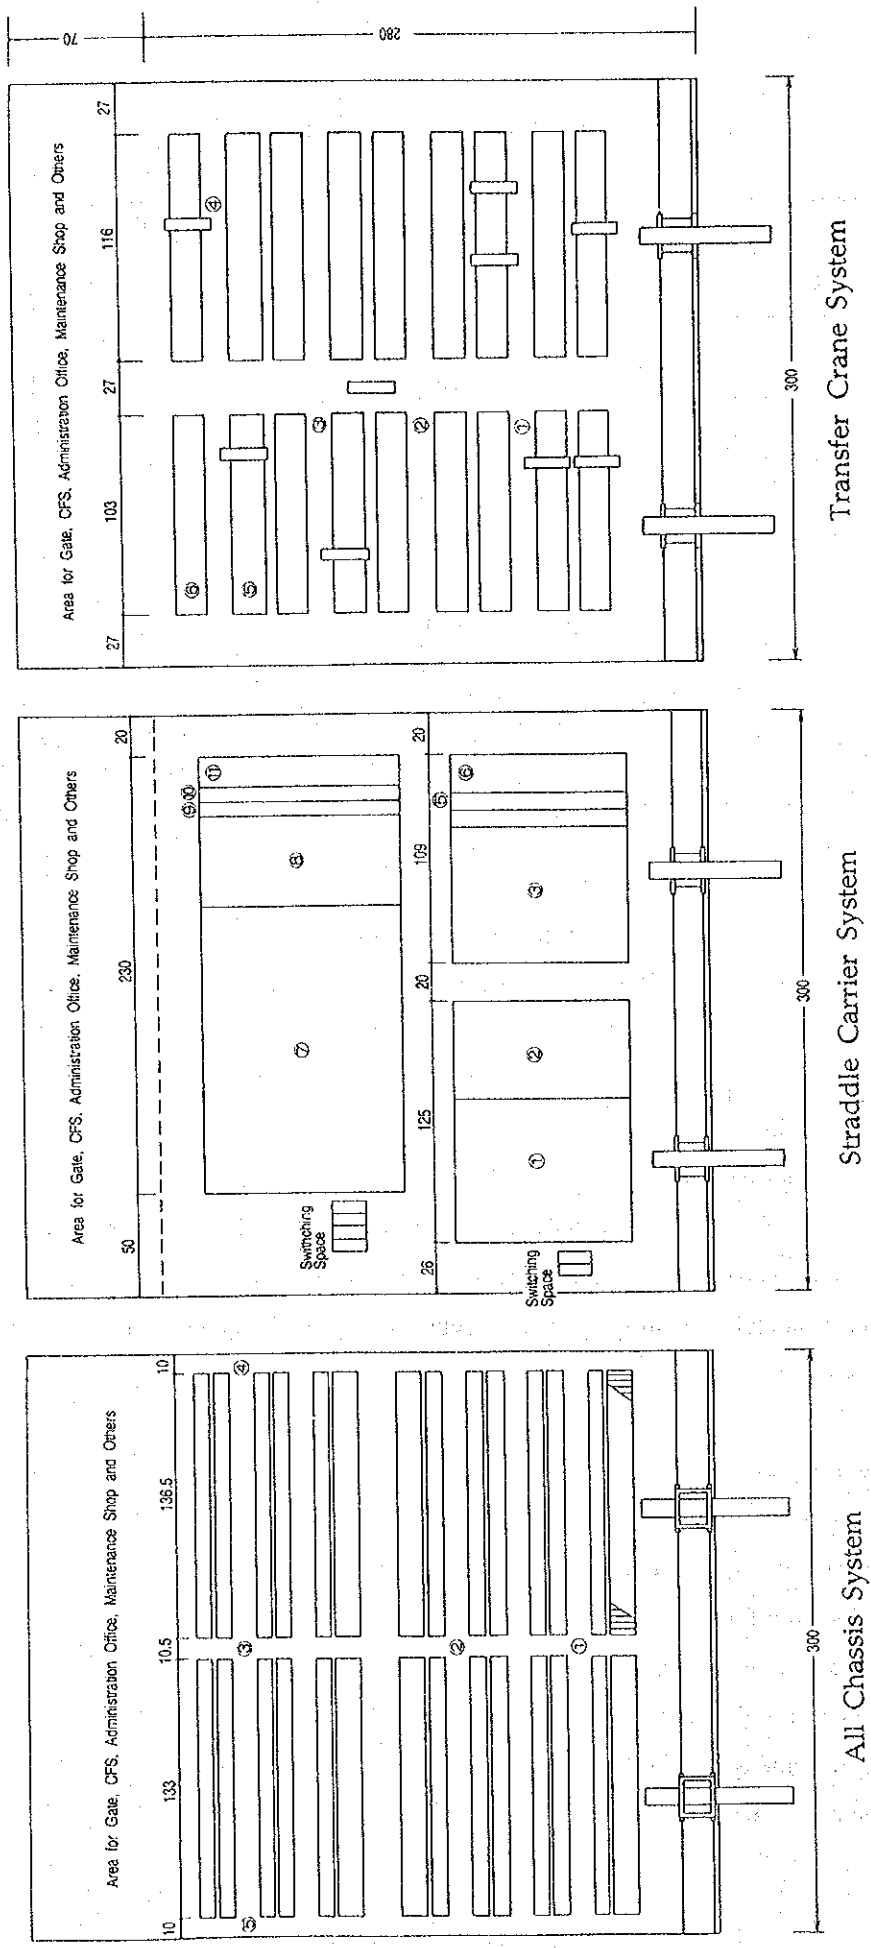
Preliminary layout plan for each alternative
